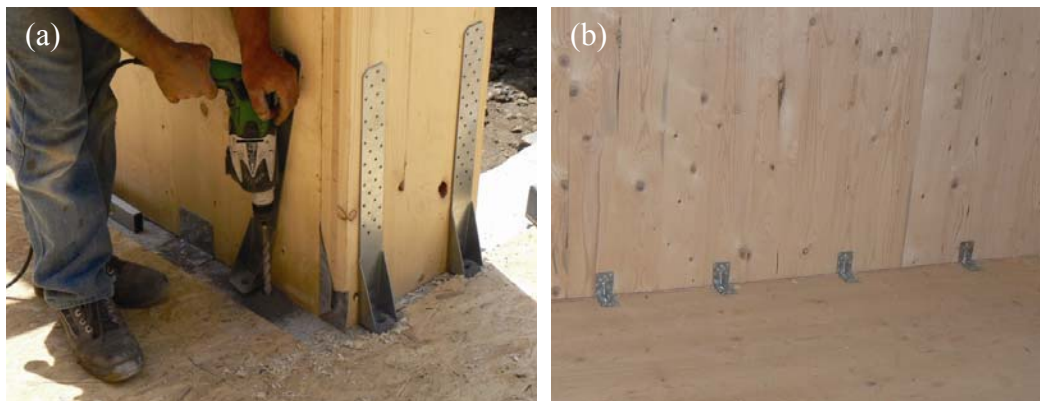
(a) Hold-down placed at wall and at opening ends to prevent the uplifting of the wall, and (b) angle bracket connection between the wall and the floor panel to prevent the sliding of the wall
